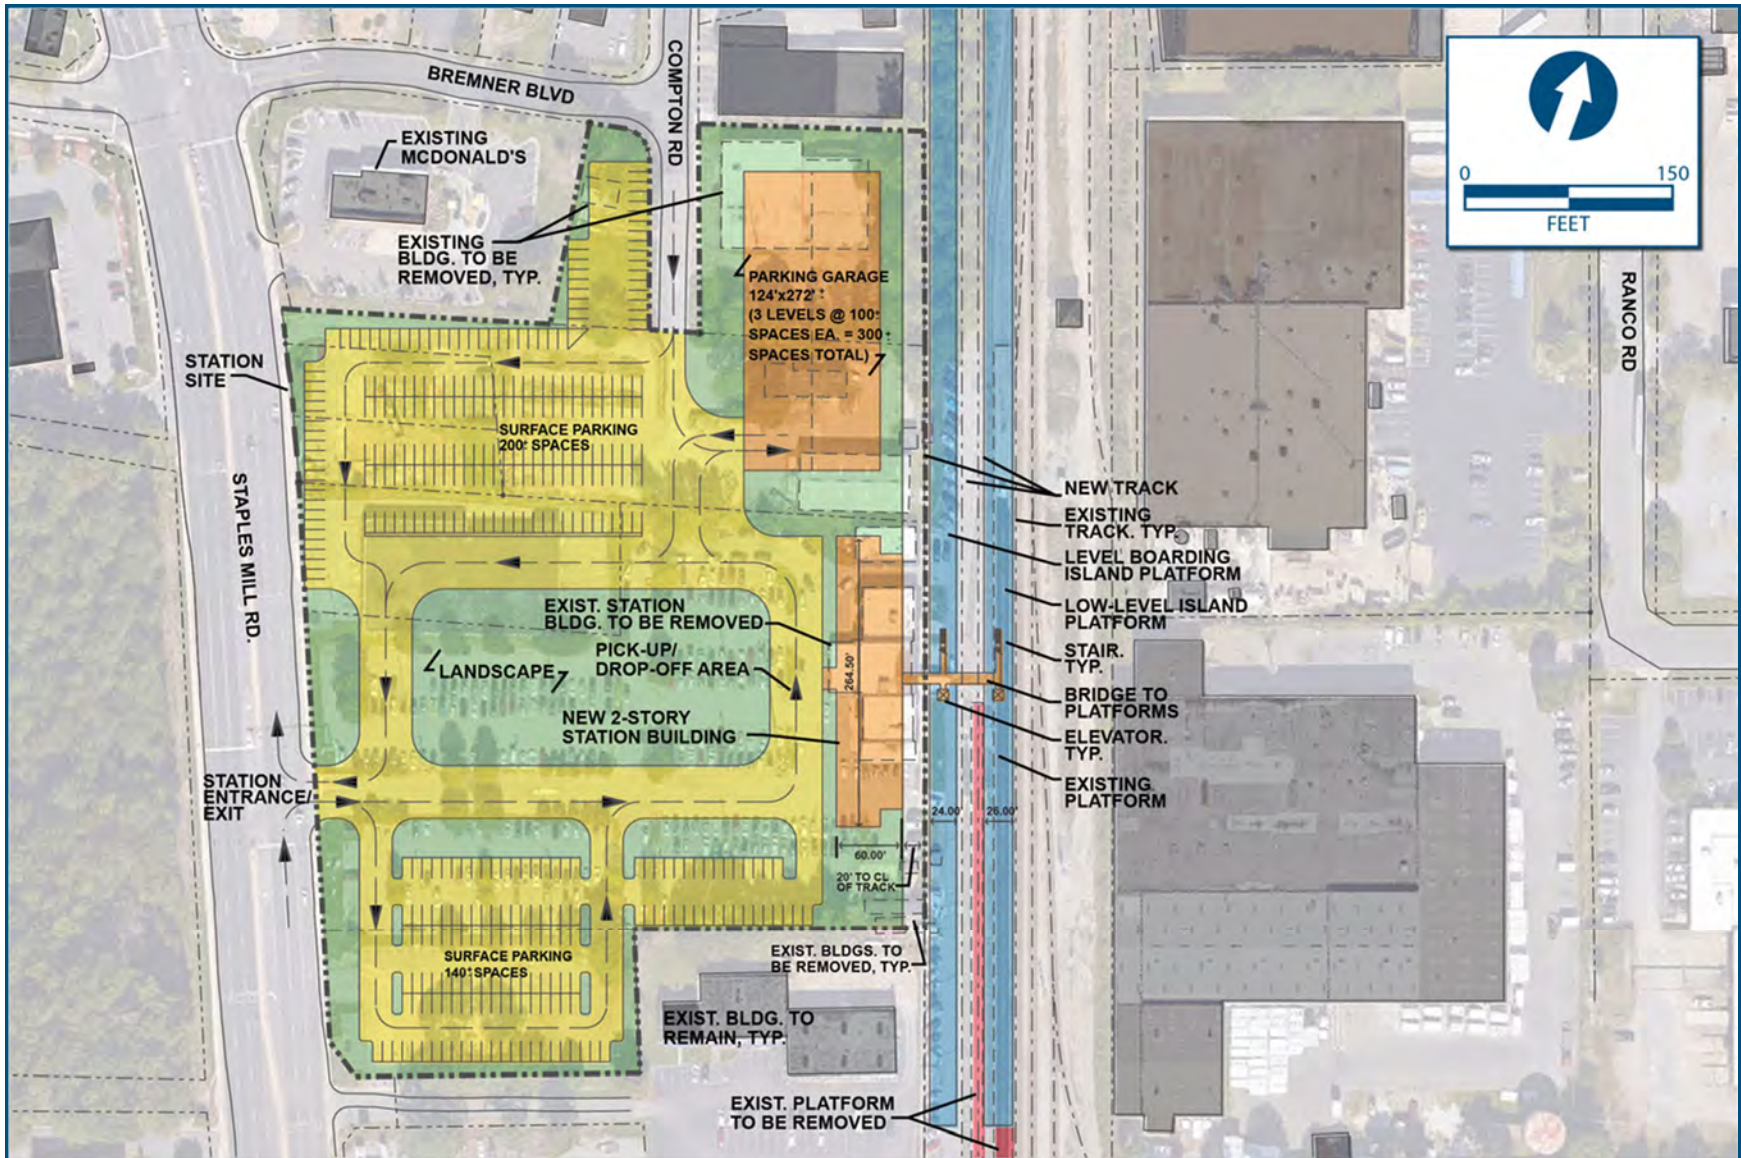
Staples Mill Road Station Improvements for Build Alternative 6A
